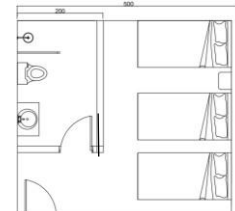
Layout sketch of Triple Bed (Azkia, 2023)
